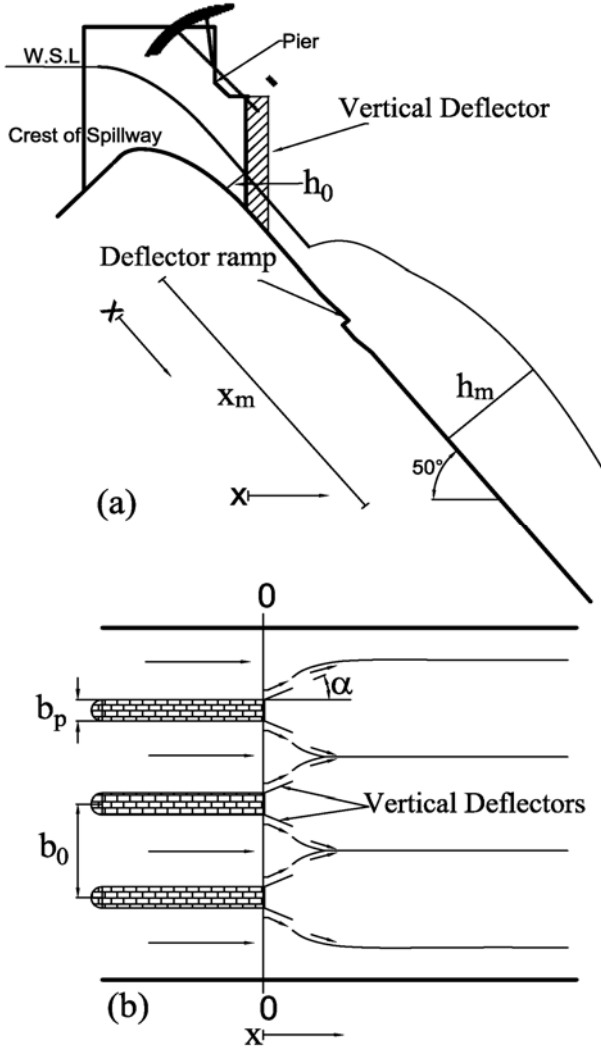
(a) Longitudinal and (b) plan views of the adopted model
